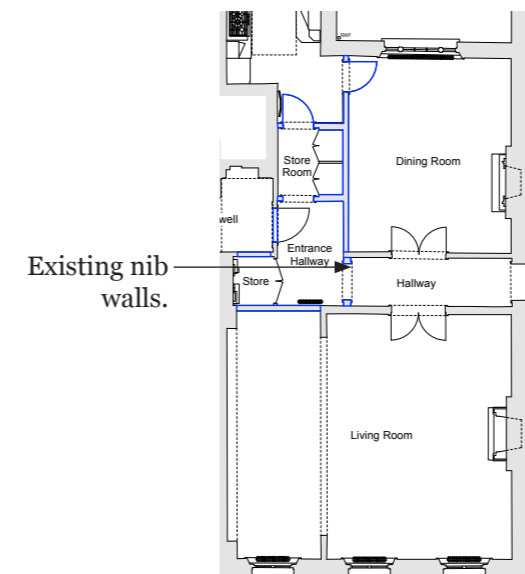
Existing Floor Plan with modern, post 1949 partitions shown in blue.
